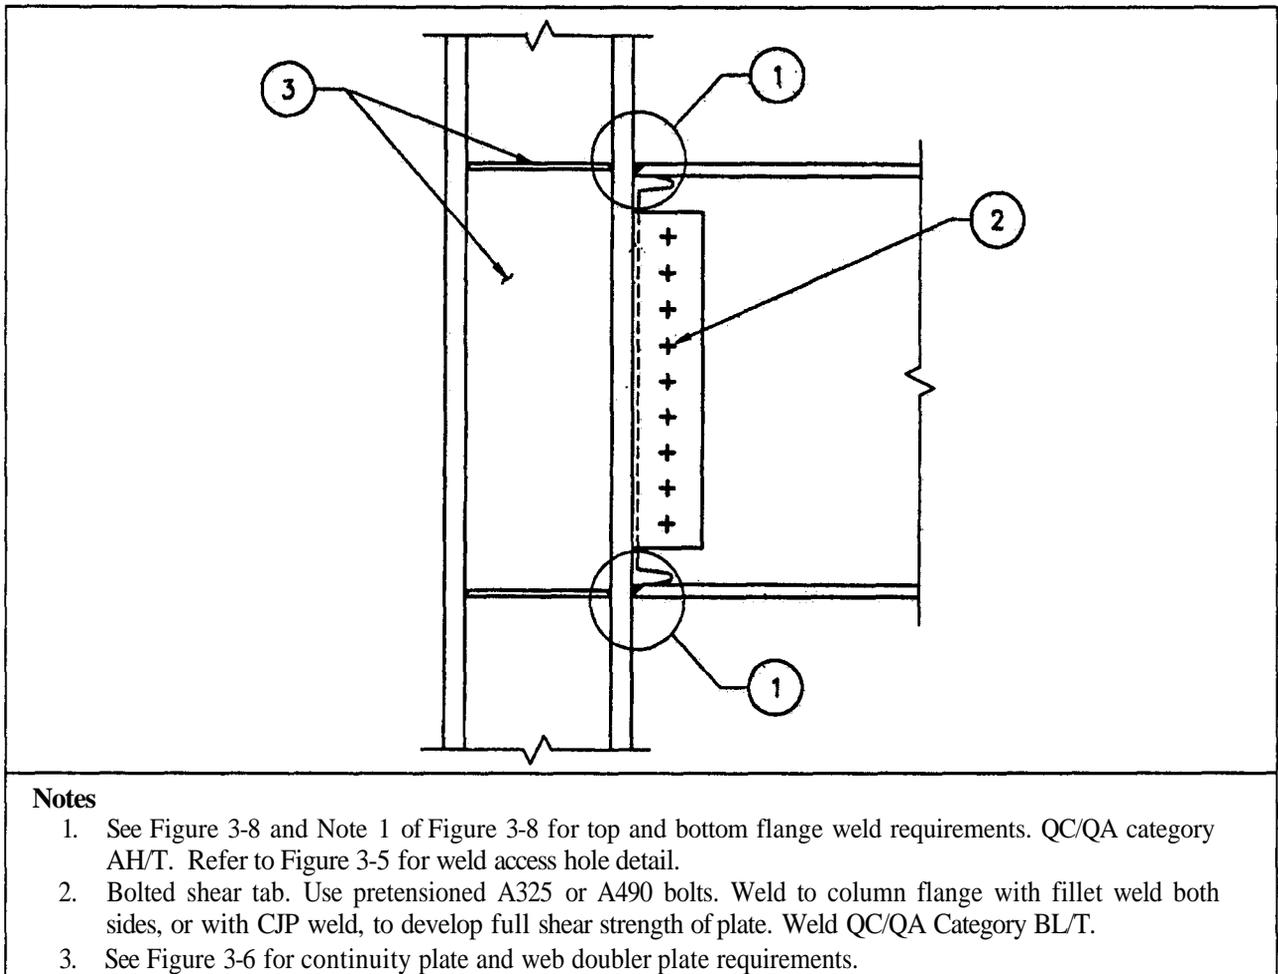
Welded Unreinforced Flange - Bolted Web (WUF-B) Connection
